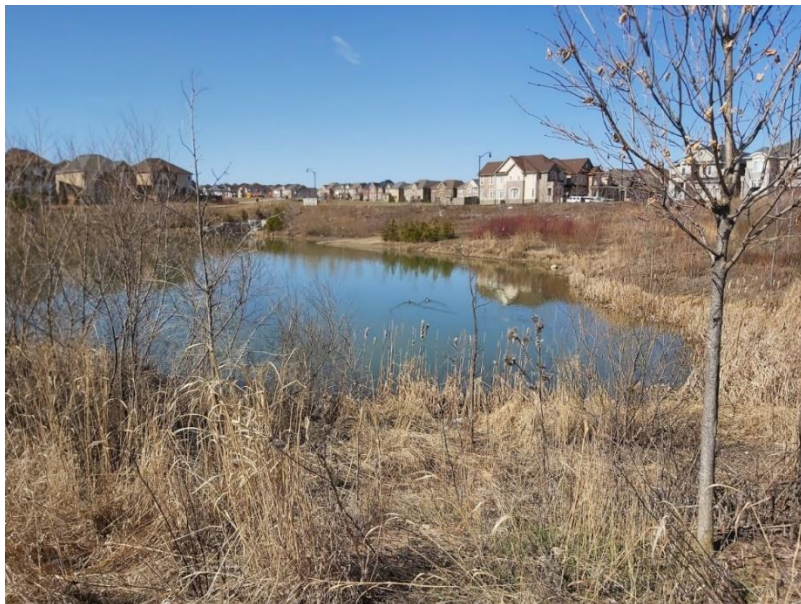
Stormwater Management Pond Outlet (HE-1). Direction: Looking north. Location: North of Wanless Dr. Coordinates: 43.692382, -79.851012
